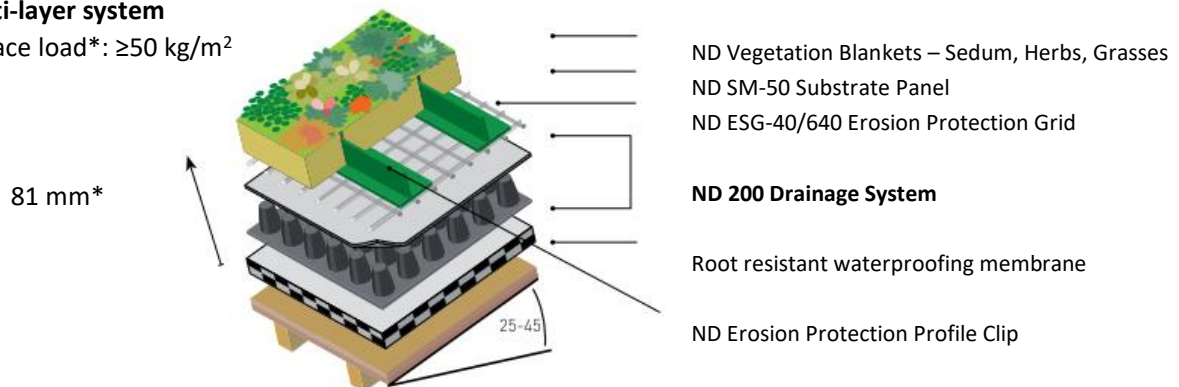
Example of steep-slope green roof (Source: Nophdrain, 2010)
